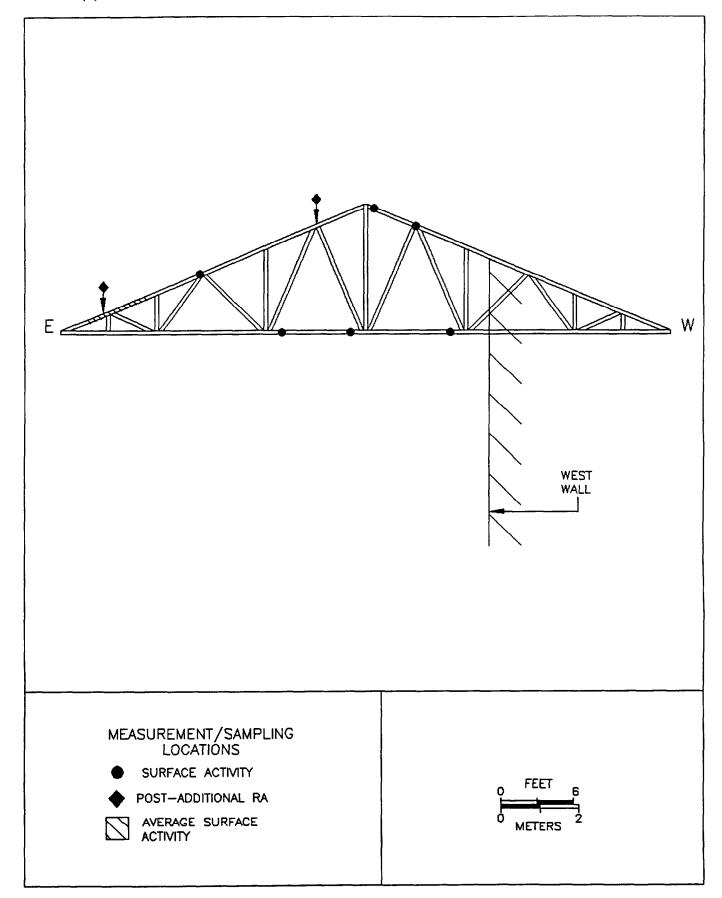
Building 8, Truss 1 (South Wall) — Measurement and Sampling Locations
